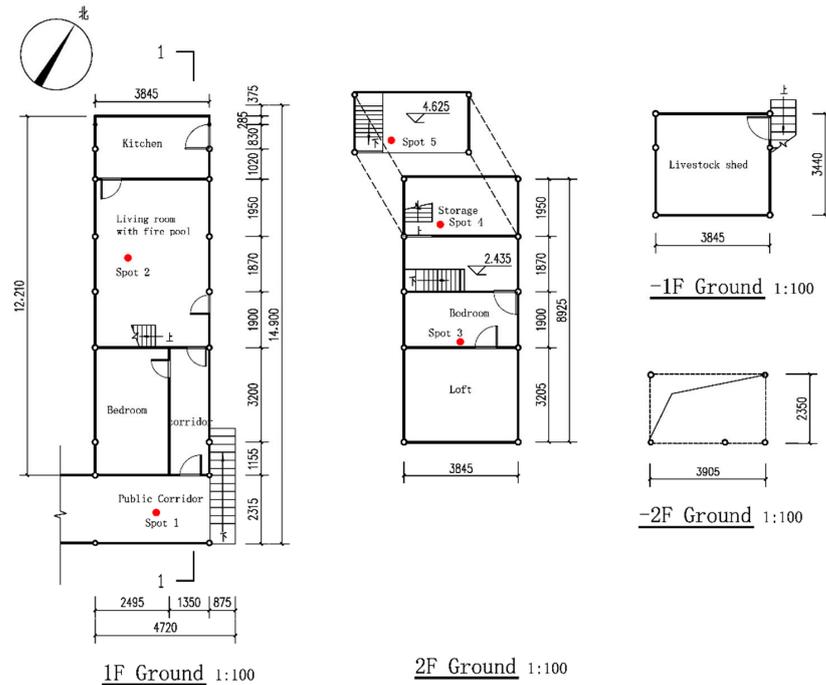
The layout of Dong Village dwelling with five monitoring points.
